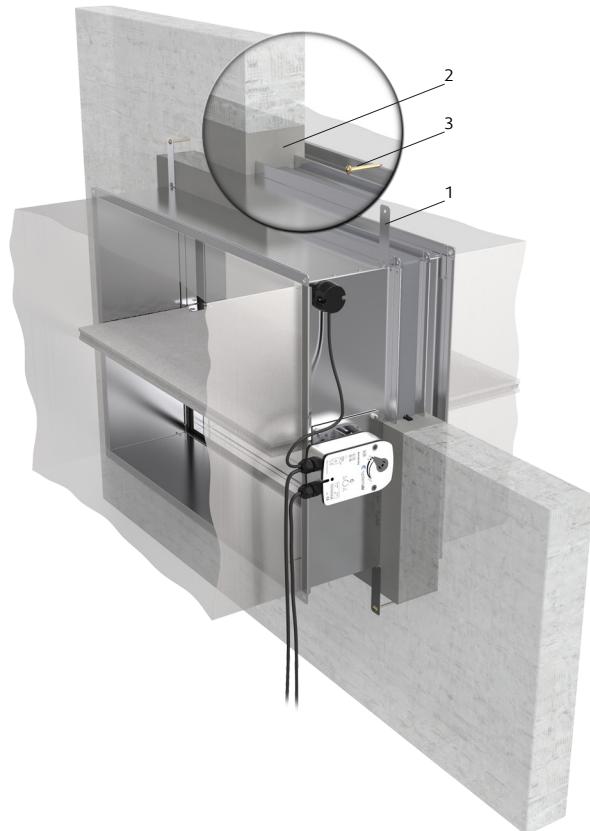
Wet installation of a rectangular fire damper PKIS using a mixture of plaster with mortar or concrete
